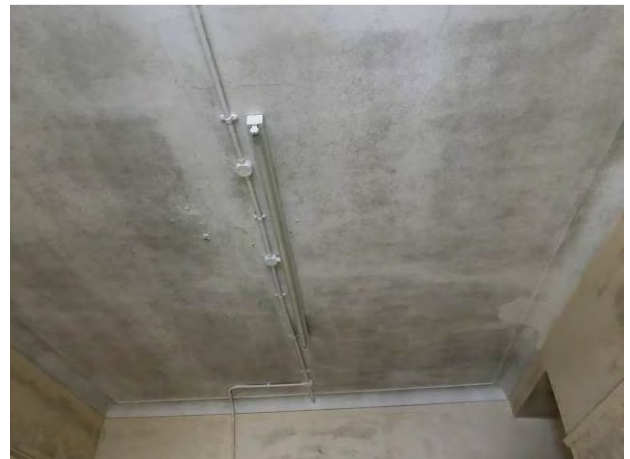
Mould growth to ceiling within room 0/008 Cloakroom
